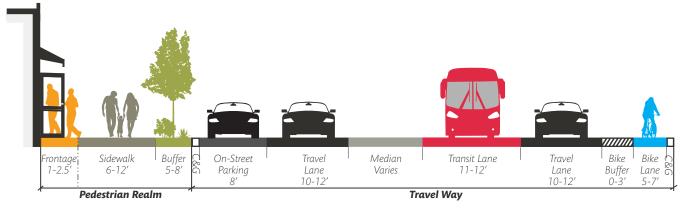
Street Element Dimensions Along Major Roads
